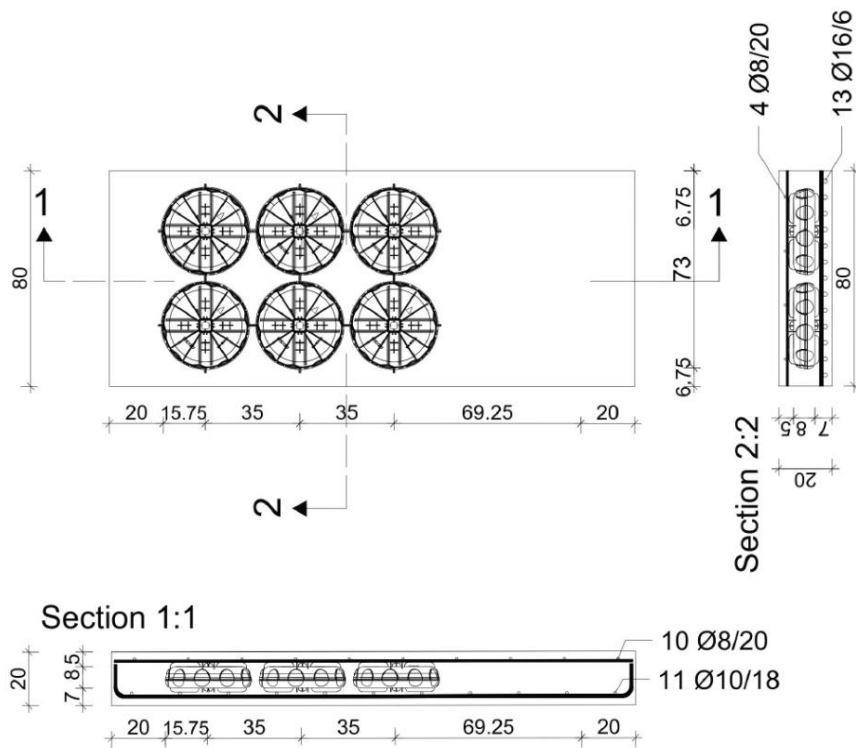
Geometric and reinforcement details of the Unidome slabs.
